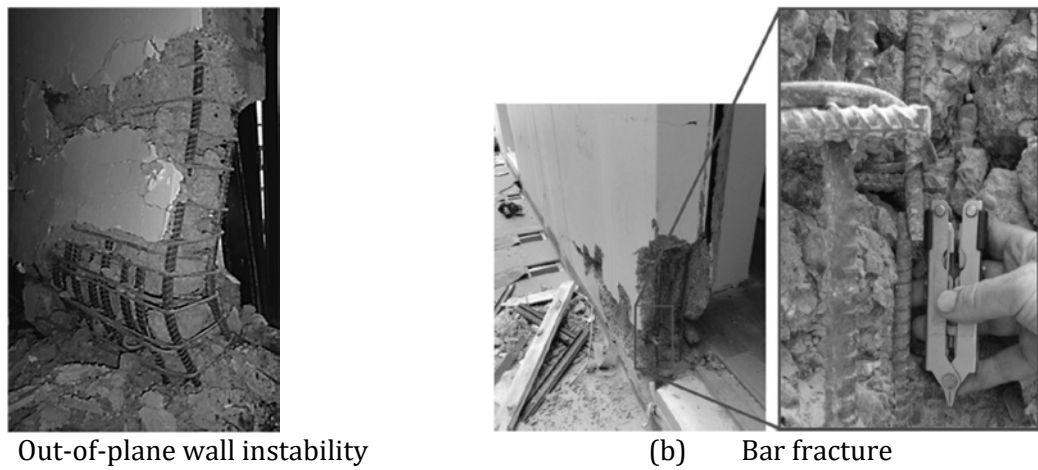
Failures in reinforced concrete structural walls after the Christchurch (New Zealand) 2011 earthquake^[29]
